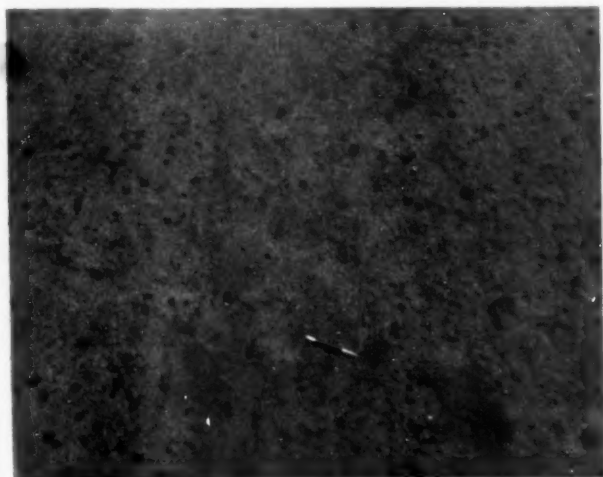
DETAILED VIEW OF SECTION 9, WHICH WAS NEVER RE-TREATED AFTER CONSTRUCTION, PHOTOGRAPHED IN APRIL, 1930
